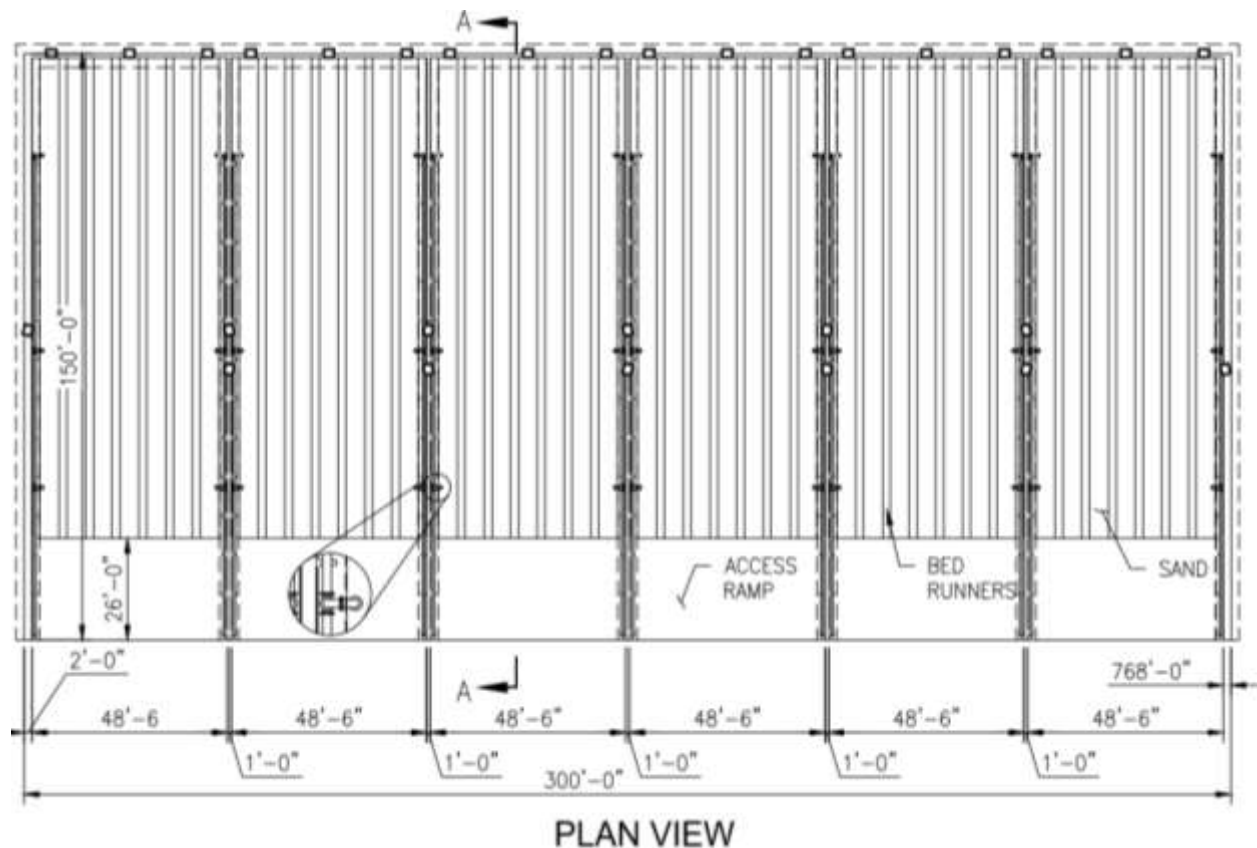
Plan view of generic six-bed enhanced non-mechanical dewatering installation
